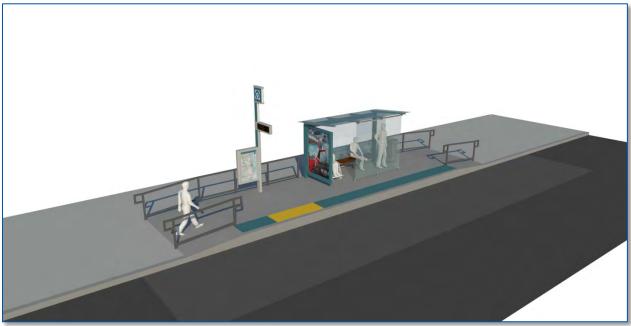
TYPICAL STATION LAYOUT FEATURING ADDITIONAL BICYCLE STORAGE
